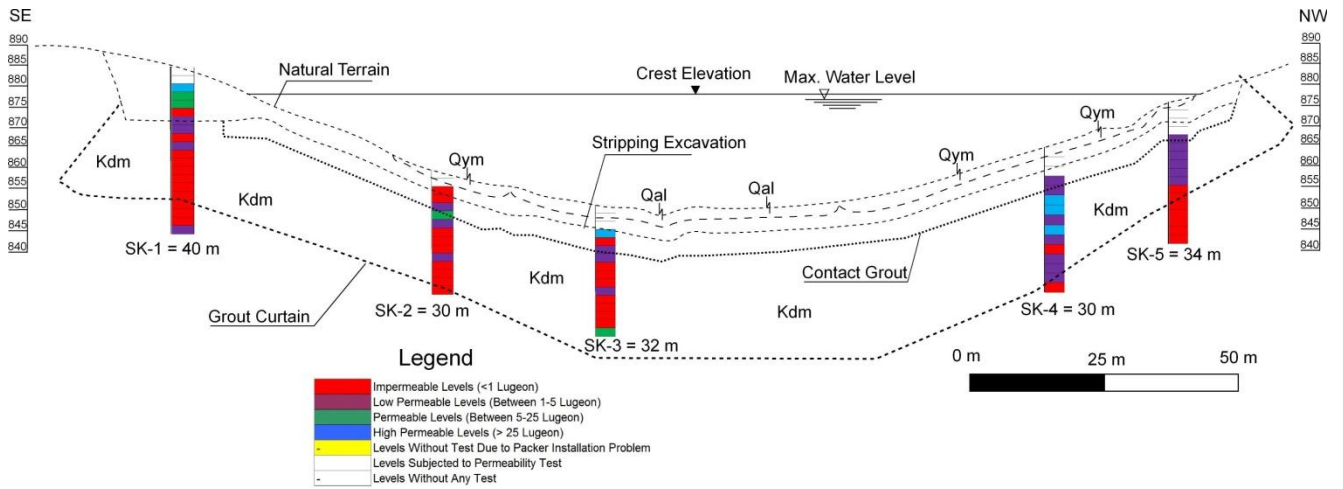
Orhanlar Dam permeability profile and grout curtain borderline
